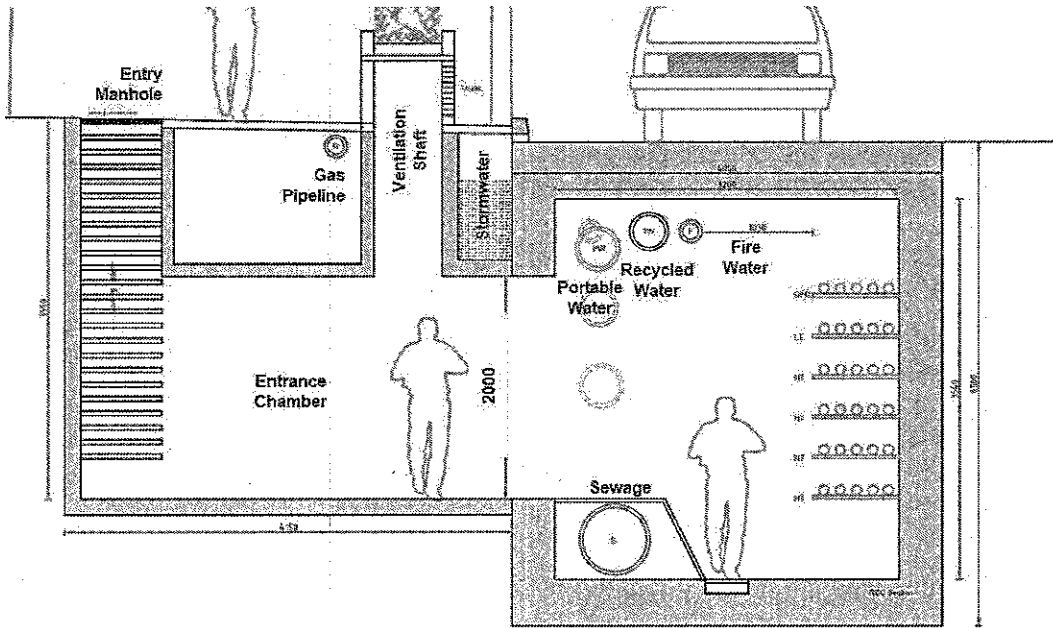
Proposed Multi Utility Tunnel Entrance Section
